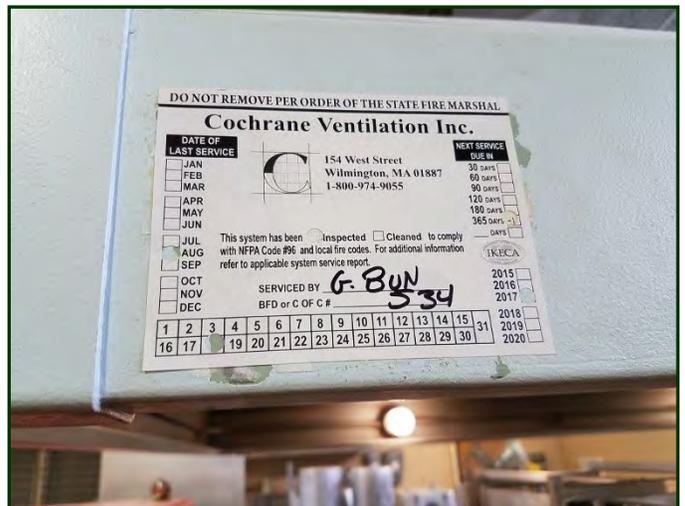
Cafeteria kitchen exhaust hood inspection tag
